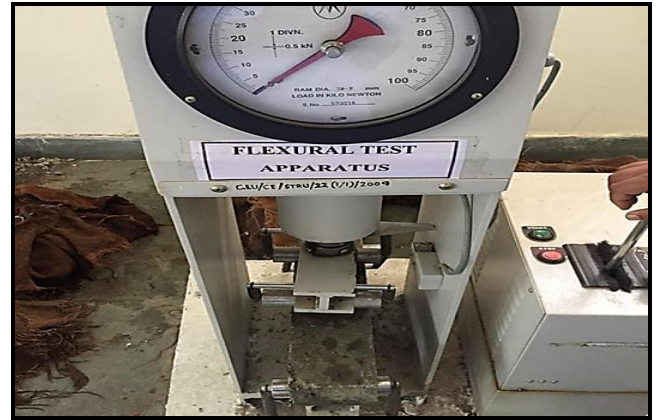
Loading on Beam under Flexural Testing Machine (FTM)
